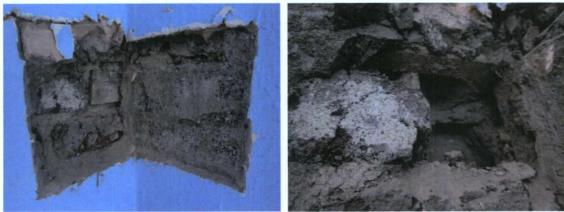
Inner face of the façade wall at the stairwell showing concrete blockwork, with repairs to the party wall.
